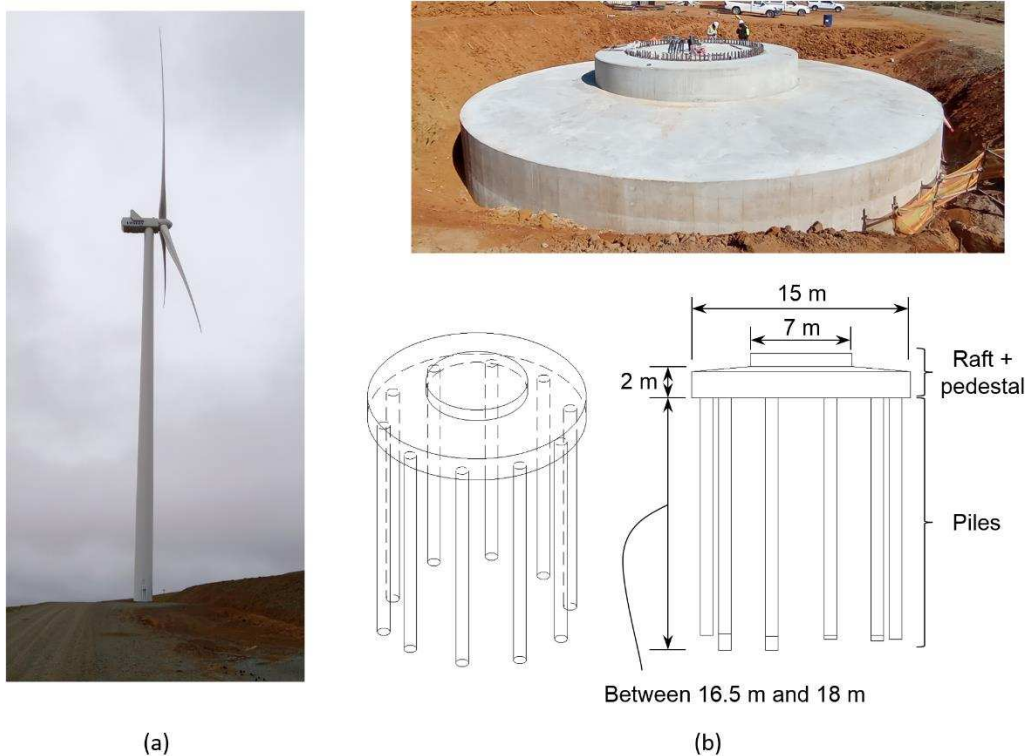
Instrumented wind turbine: (a) wind turbine; (b) reinforced-concrete foundation.
